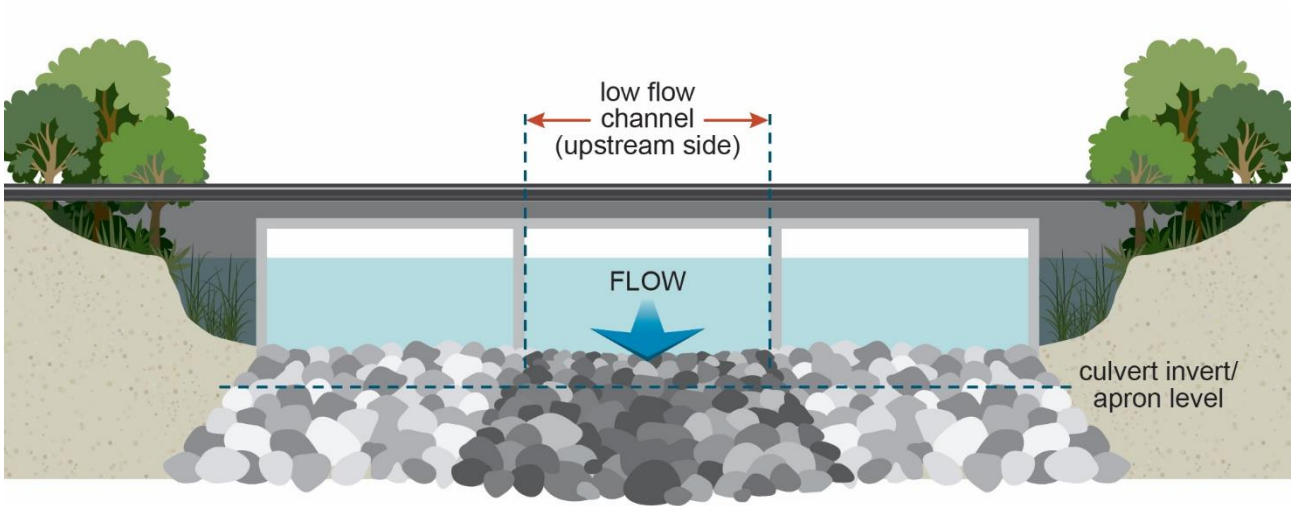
Interim rocked fish ramp on existing culvert crossing (cross-section of waterway) – purple, red, amber and green waterways
